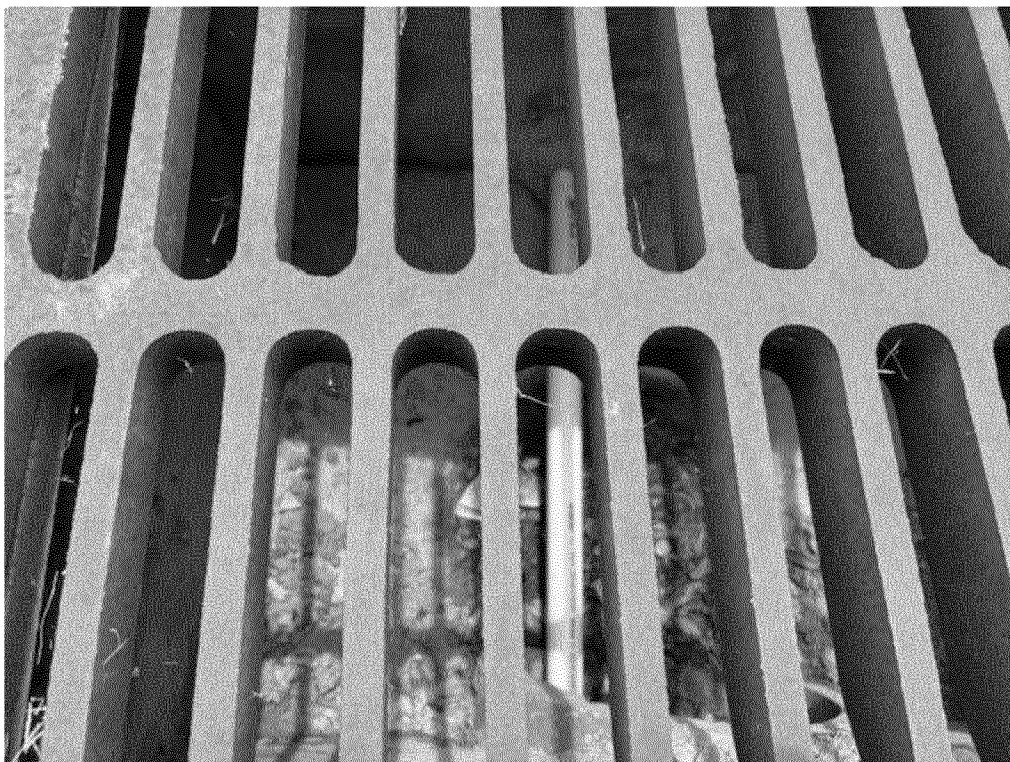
Unknown PVC pipe through storm box on Backspin Lane
